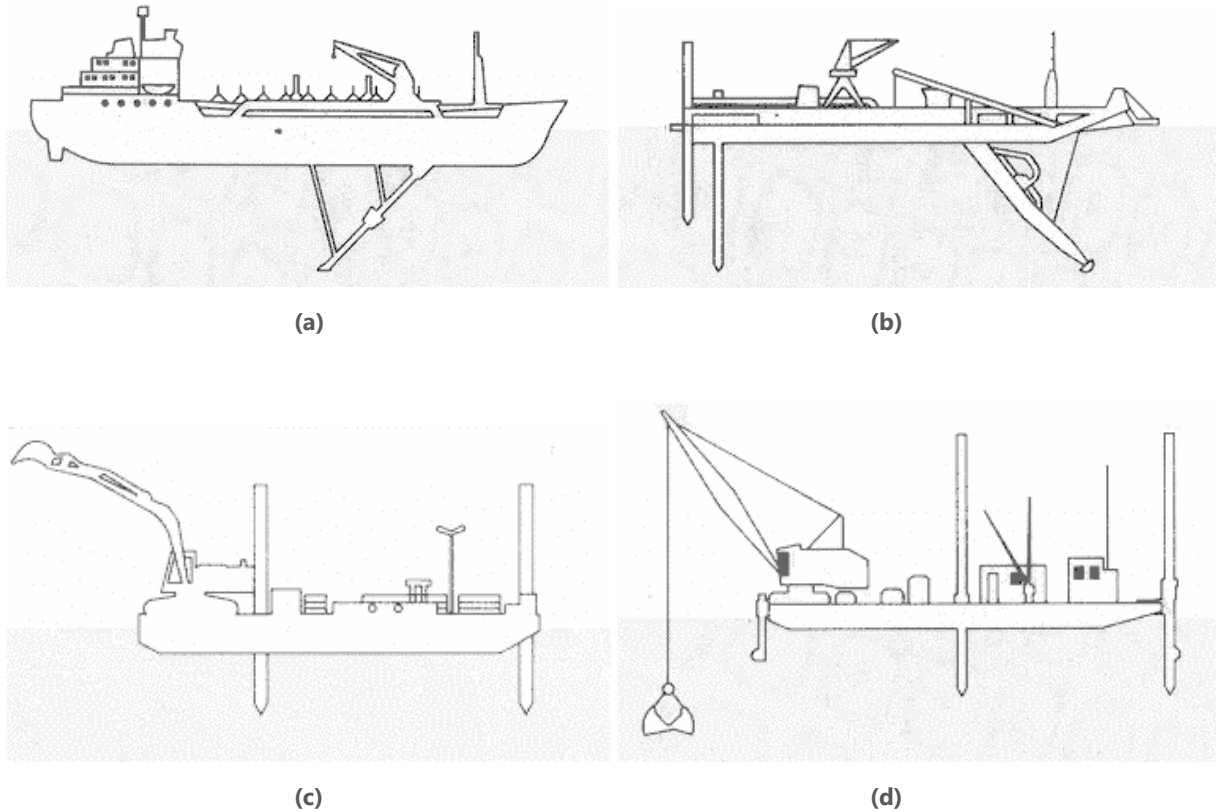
Schematics of channel maintenance equipment: (a) Trailer Hopper Suction Dredging, (b) Cutter Suction Dredging, (c) Excavator Mechanical Dredging, and (d) Clamshell Mechanical Dredging.
